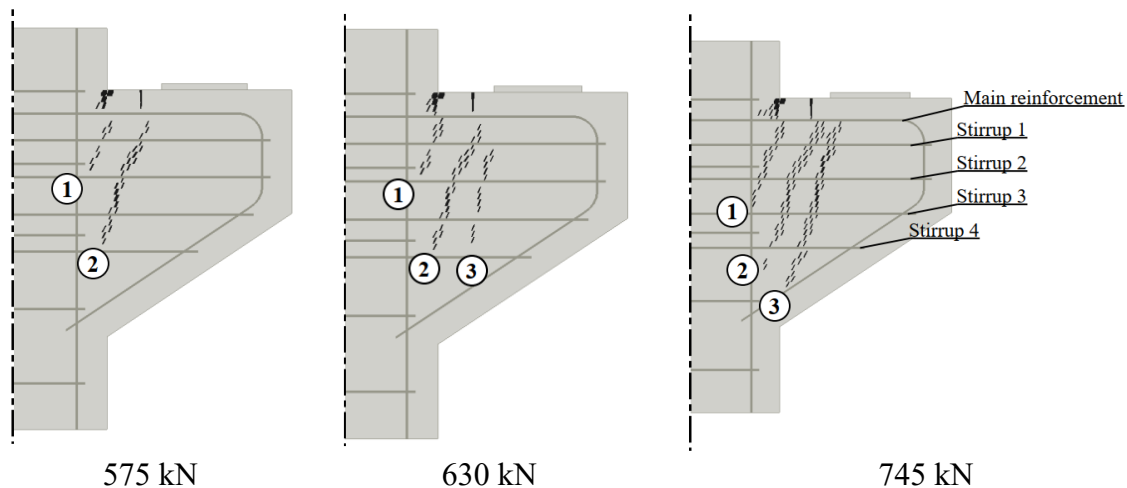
Crack propagation, of cracks larger than 0.05 mm, in the corbels at an applied vertical load of 575 kN, 630 kN, and 745 kN.
